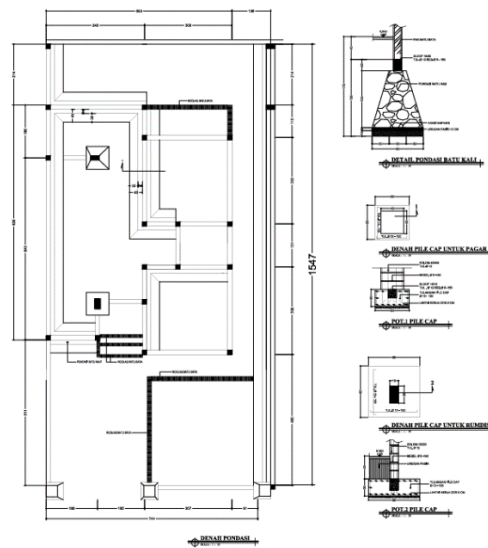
Foundation Structure Plan of Official Residence, Jl. Manukan Tengah
